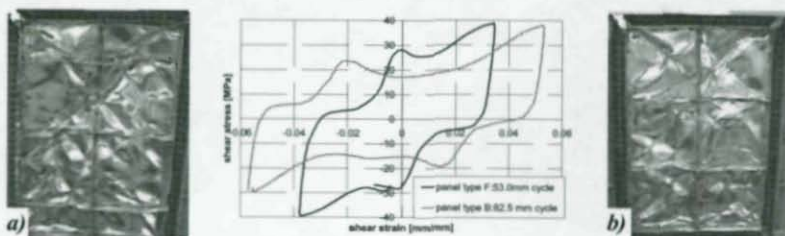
Tearing of sheeting material and connection failure for shear panel type F (a) and type B (b).
